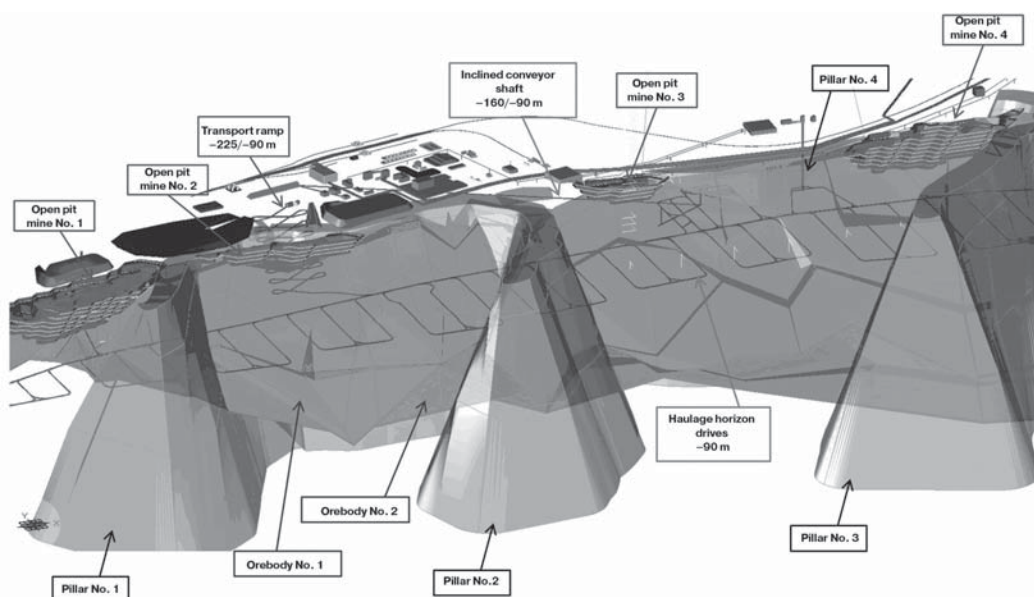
Mining stage 1, down to level -90 m, in accordance with layout no. 2
